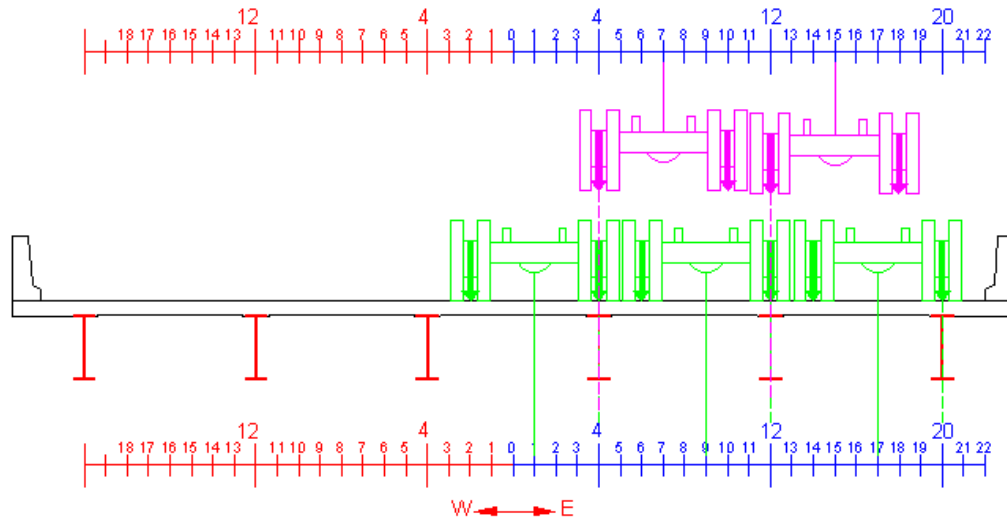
Transverse Truck Positions TR-1, 7, 9, 15, and 17 Loading the Girders
